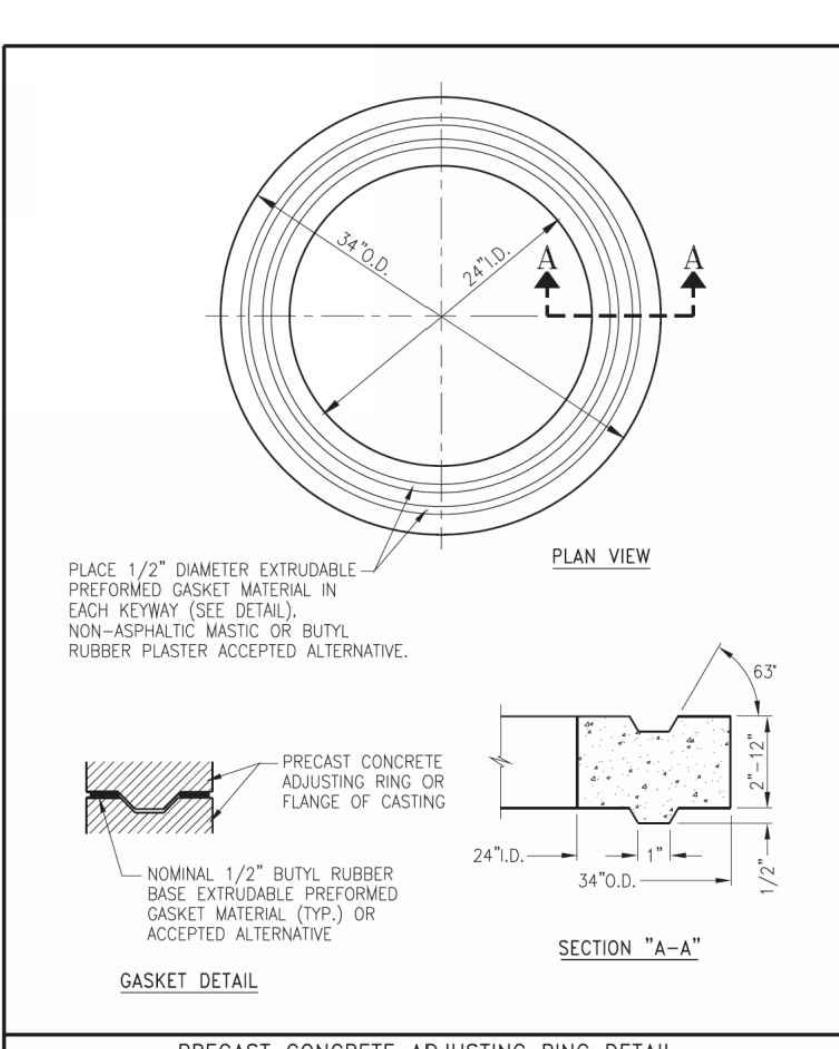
Precast Concrete Adjusting Ring Detail
